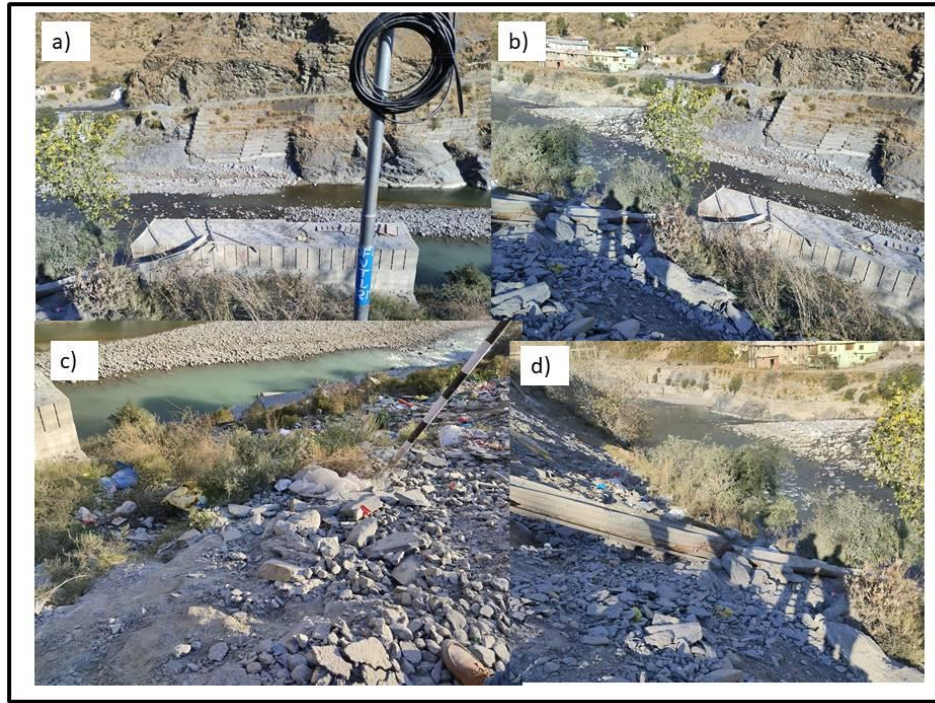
Image depicts a) damaged retaining wall raised within the water body due to subsidence of the foot of the wall b) Damage to the retaining wall on right bank of the river c and d) area river and road indicating enough space for raising protections walls.
